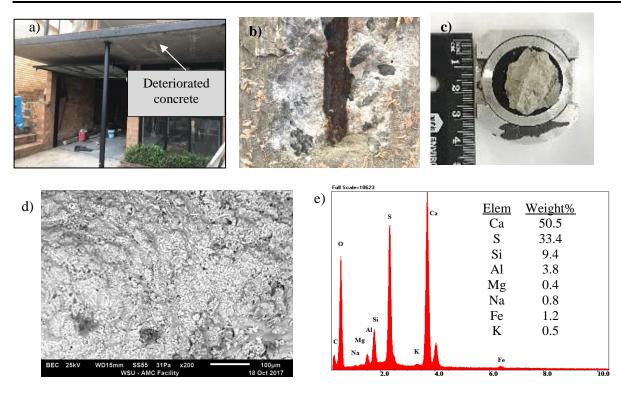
a) Defect under the balcony's reinforced concrete slab, b) corrosion of reinforcing bar and c) mounted sample for SEM/EDS analysis, d) SEM and e) EDS analysis of the deteriorated area of the concrete balcony slab
